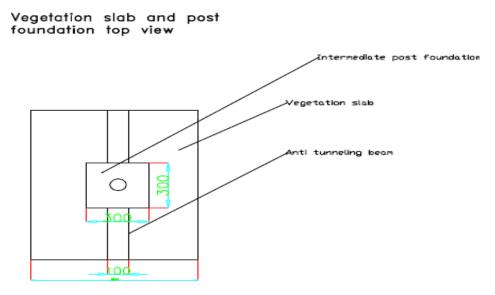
Vegetation Slab and Anti-tunnelling Beam Plan Layout
